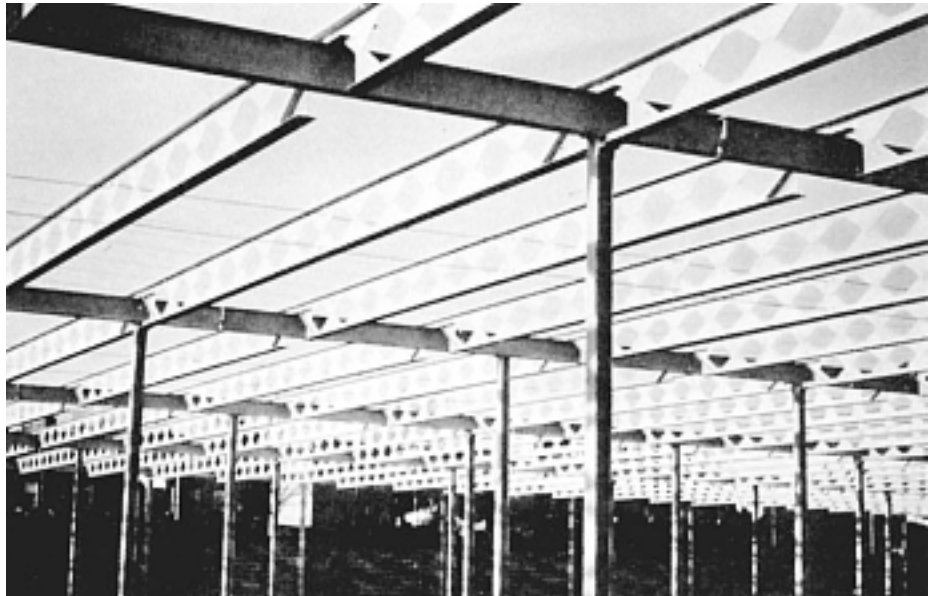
Castellated steel beams. (Courtesy of American Institute of Steel Construction)
